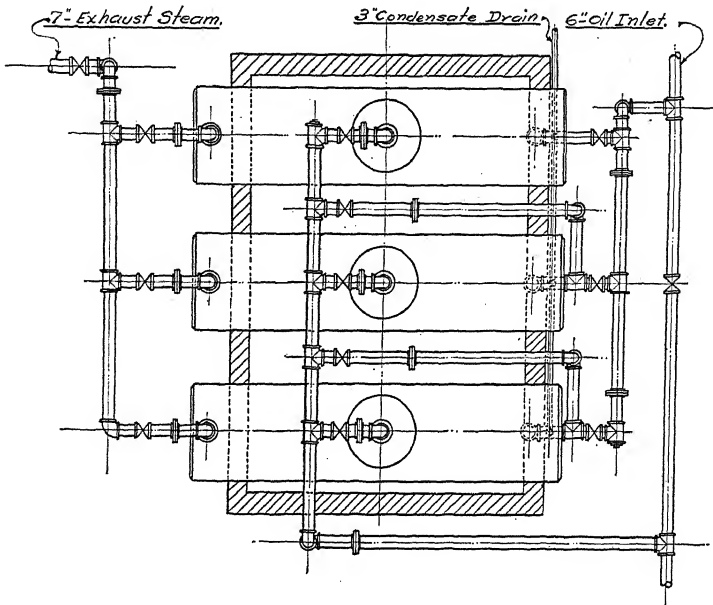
FIRST OIL-HEATING PLANT. PLAN.
